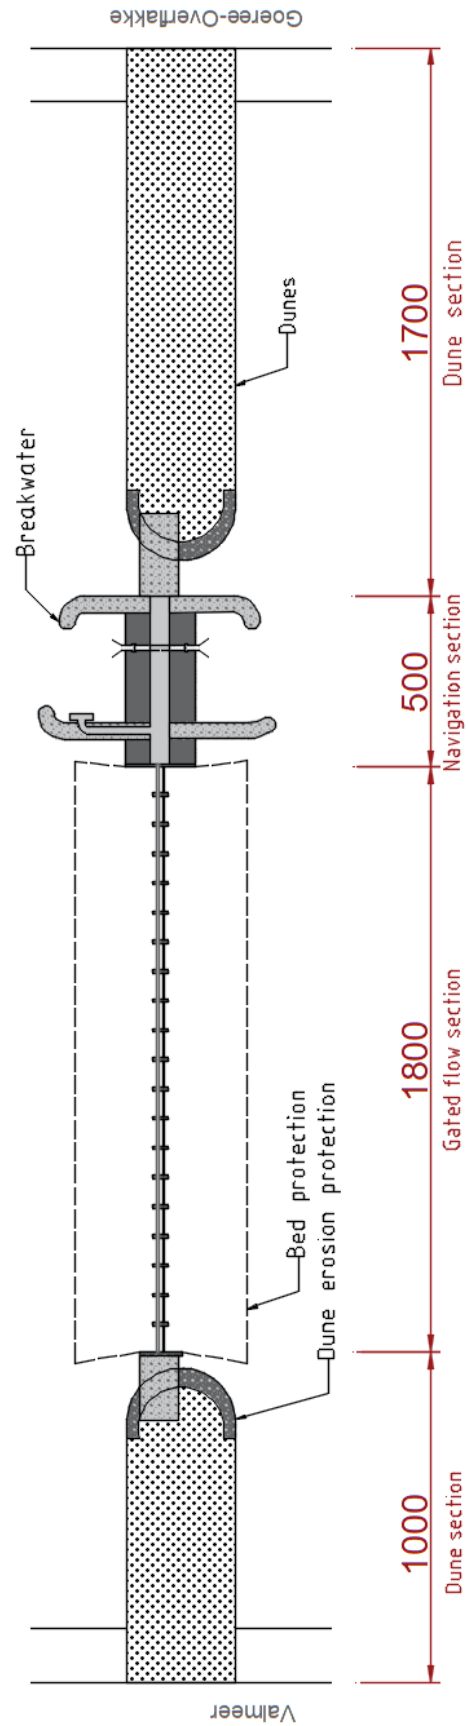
Conceptual spatial design for the New Haringvliet barrier. The dune sections are connected to the structural barrier elements by short breakwater sections. The navigation section is a shipping lock sheltered by breakwaters.
